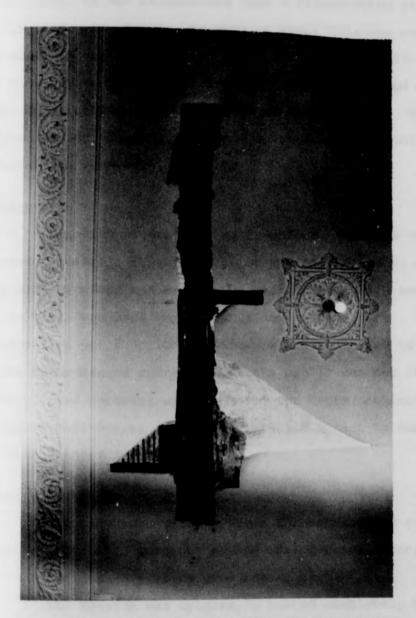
Ceiling in the Ballroom Showing the Plaster and Canvas Finish and the Chasing for the Electrical Conduits
